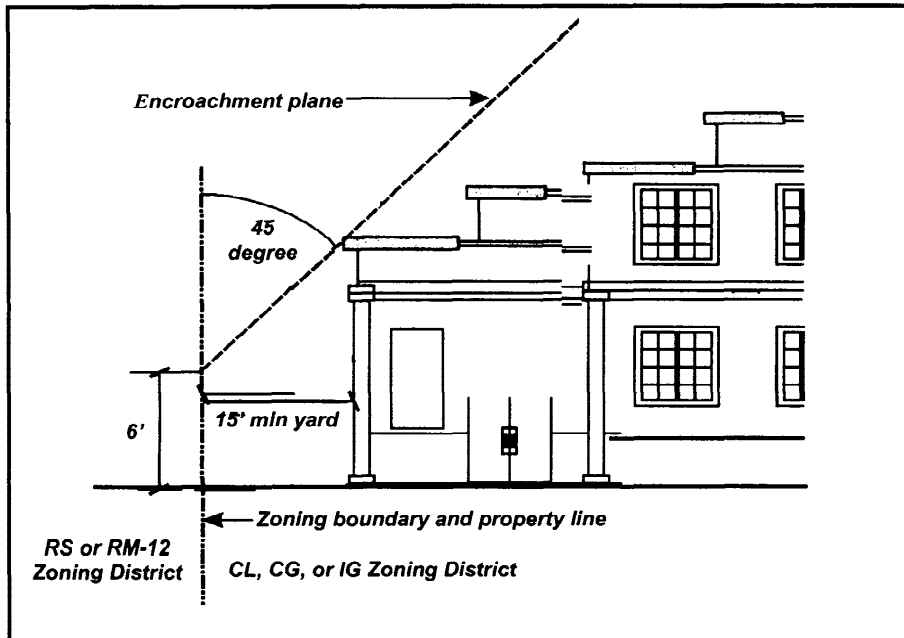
Encroachment Plane Requirements for Projects Abutting RS and RM-12 Zoning Districts
